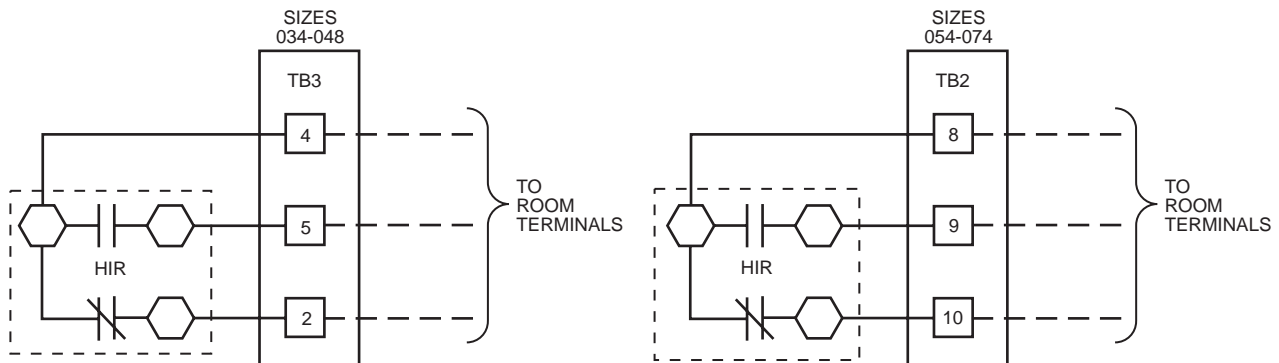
Heat Interlock Relay Wiring (PIC Control Units)
